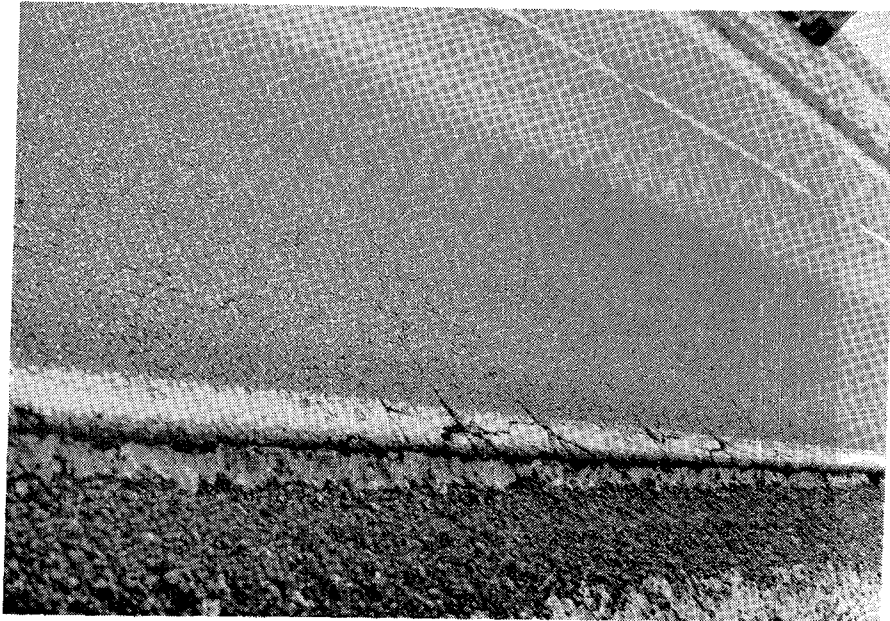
Illustration of alligator (fatigue) cracking distress in wheelpaths of flexible pavements (FLEX-7, Illinois).
